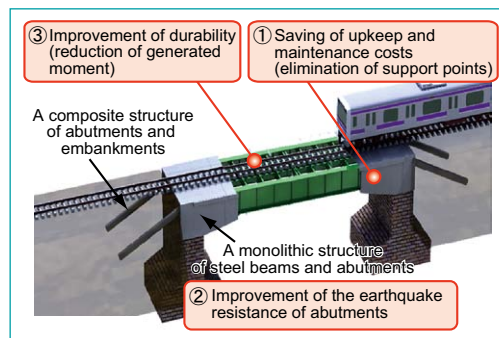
Construction of a monolithic structure of steel beams, abutments and embankments (elimination of subjects (1), (2) and (3))
